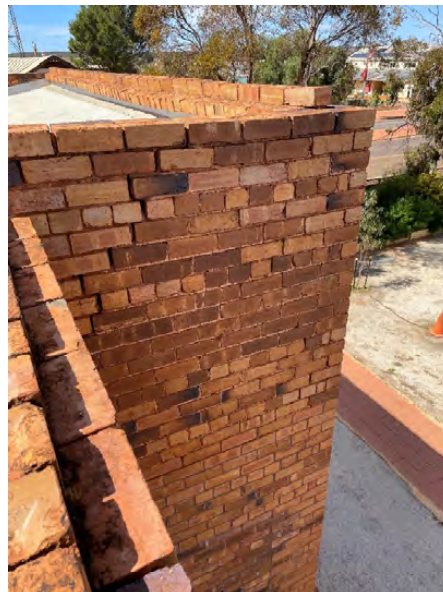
Cracking to external masonry, slight rotation of return wall
